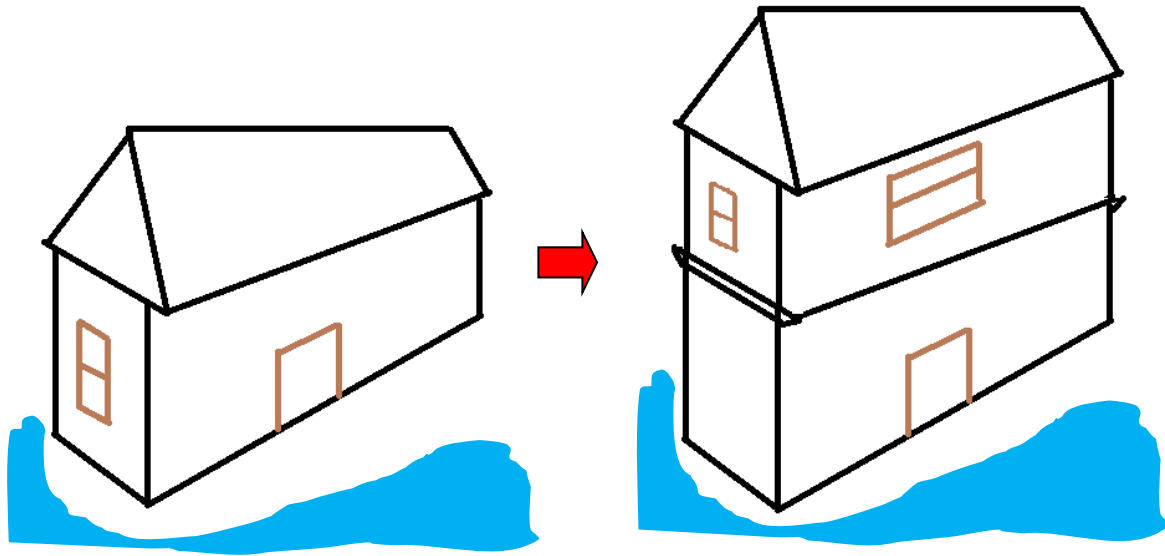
Building elevation by adding upper stories (Created by Author)
